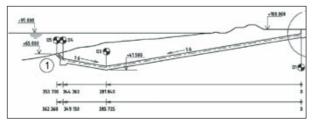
Longitudinal section of the Outlet Tunnel with spoil trap and low point. (Illustration: Multiconsult /Statoil)
